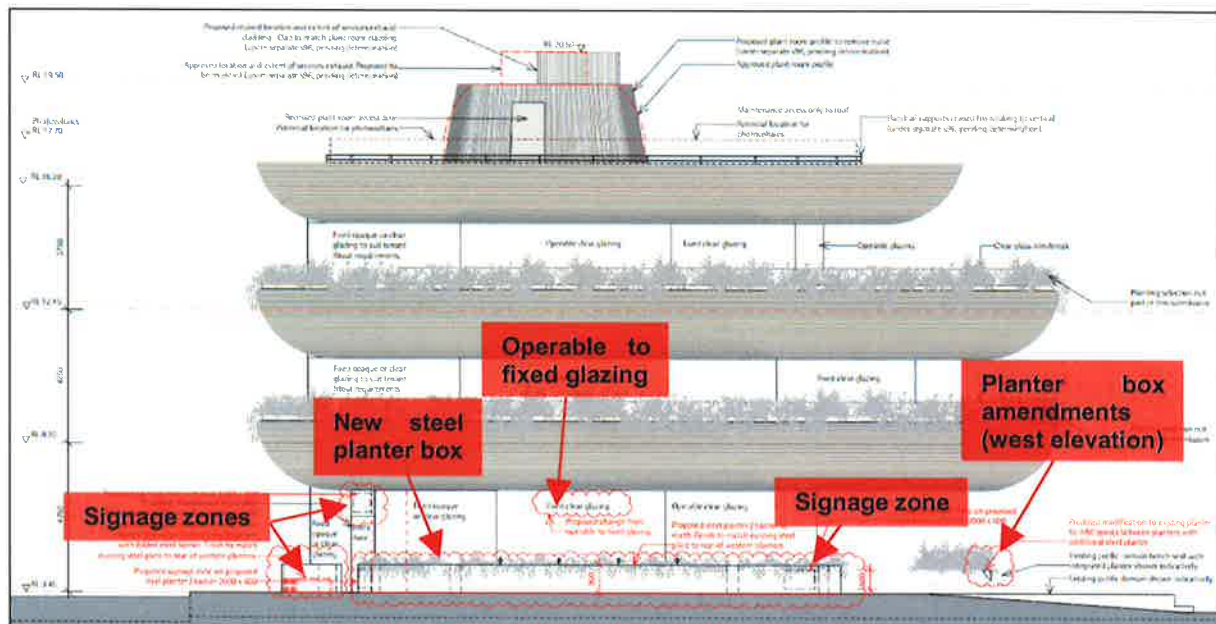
Proposed modifications to northern elevation (Source: Applicant)
